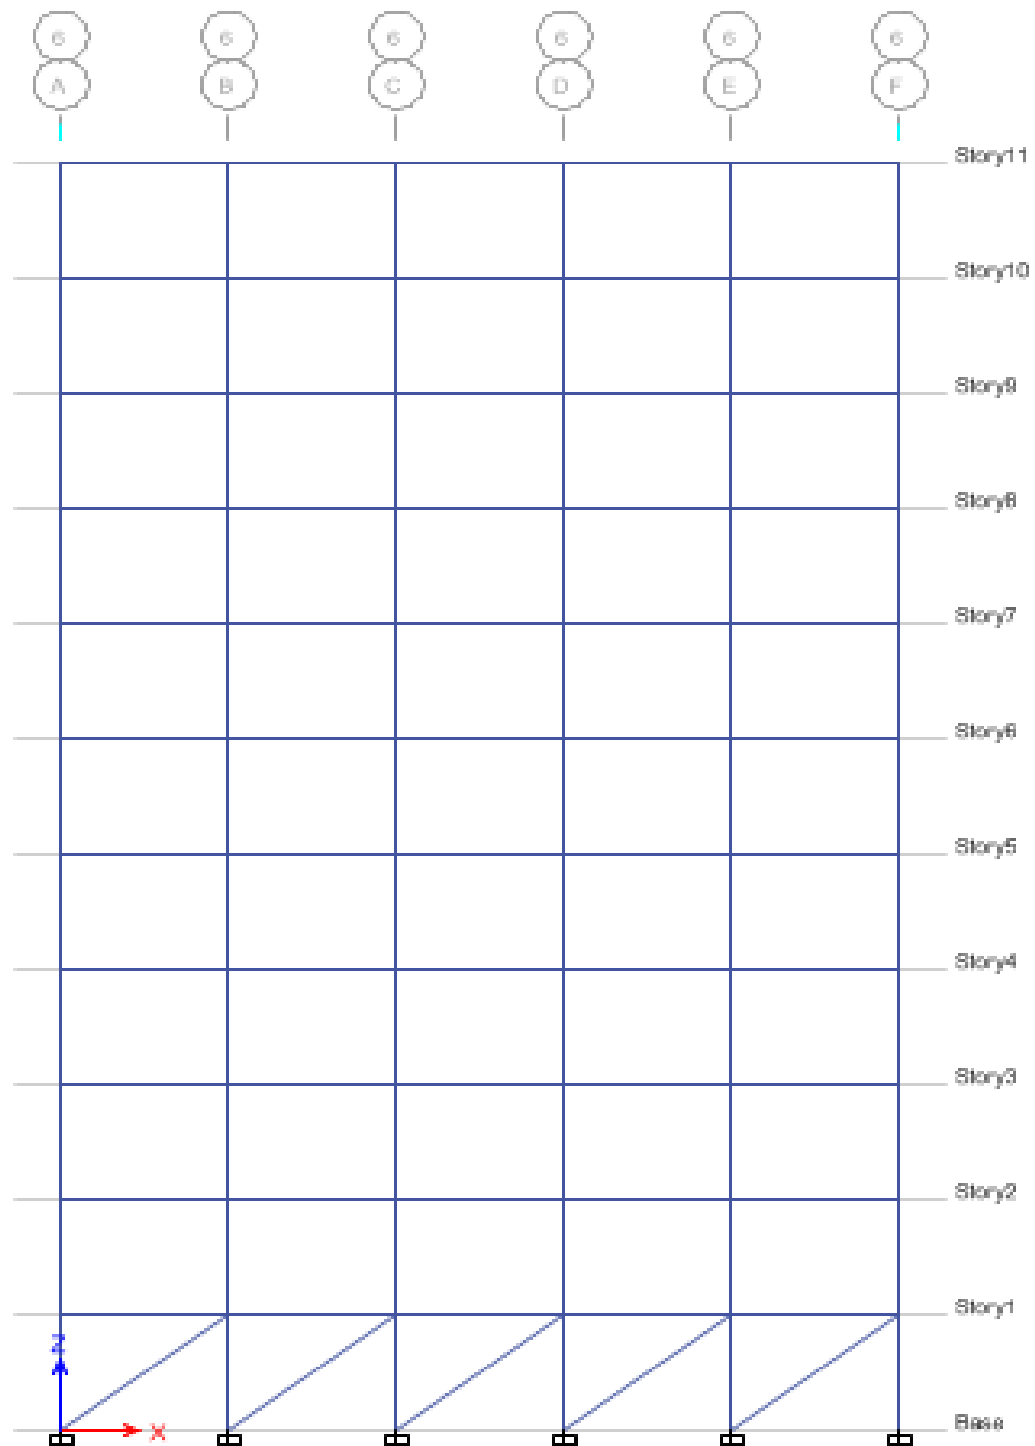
Elevation of Building Having Single Bracing in Ground
